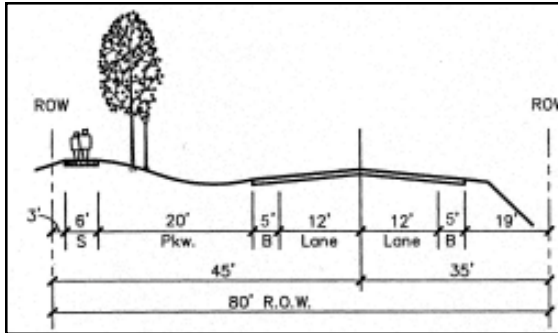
Proposed Washington Boulevard extension cross section.
